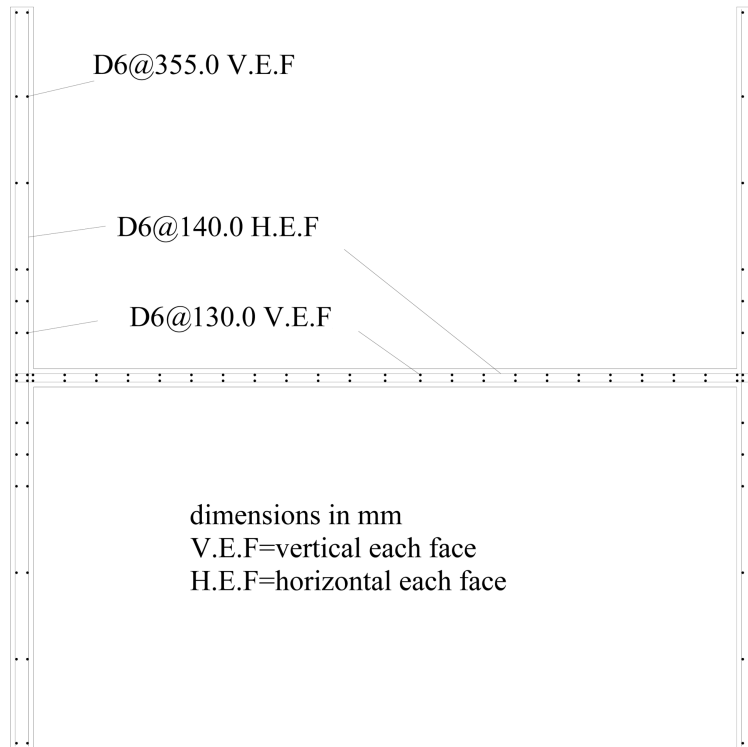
Reinforcing layout of walls (Palermo and Vecchio 2002)
